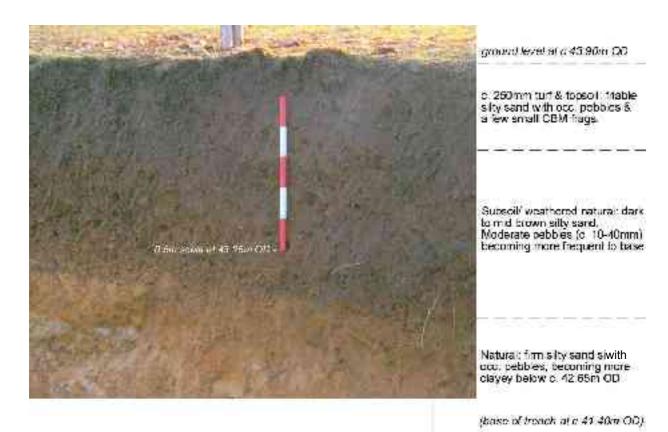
Detail of exposed section and general view of pipe trench and adjacent inspection chamber excavation, looking southeast (for location see Fig 4)
